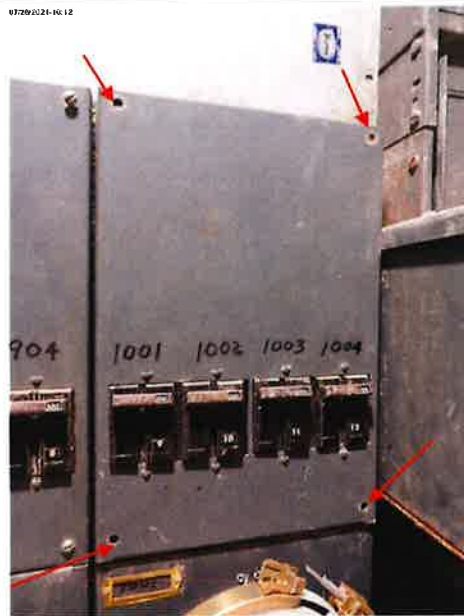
North building, tower 3, meter room at level 9: circuit-breaker cover missing screws.
